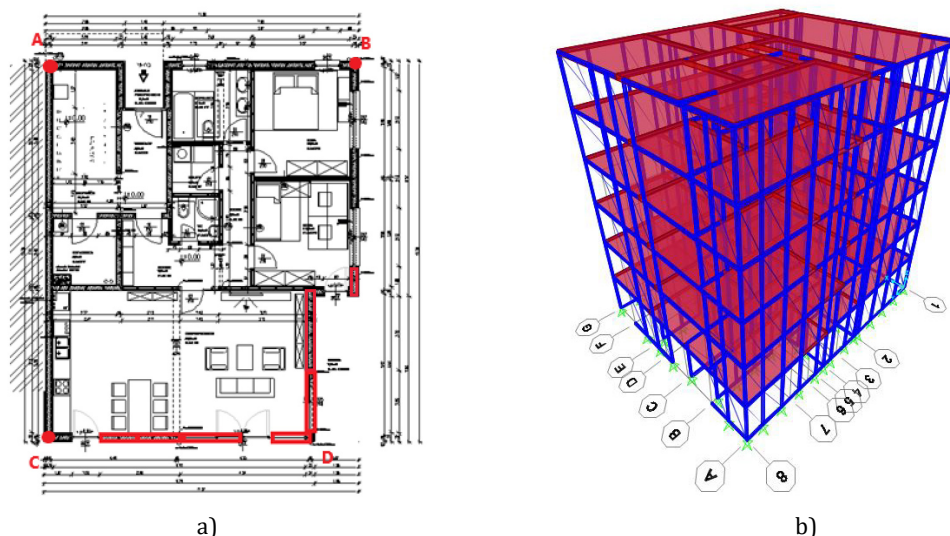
a) Floor-plan of the building; b) Computational model of the structure made by SAP 2000 software
